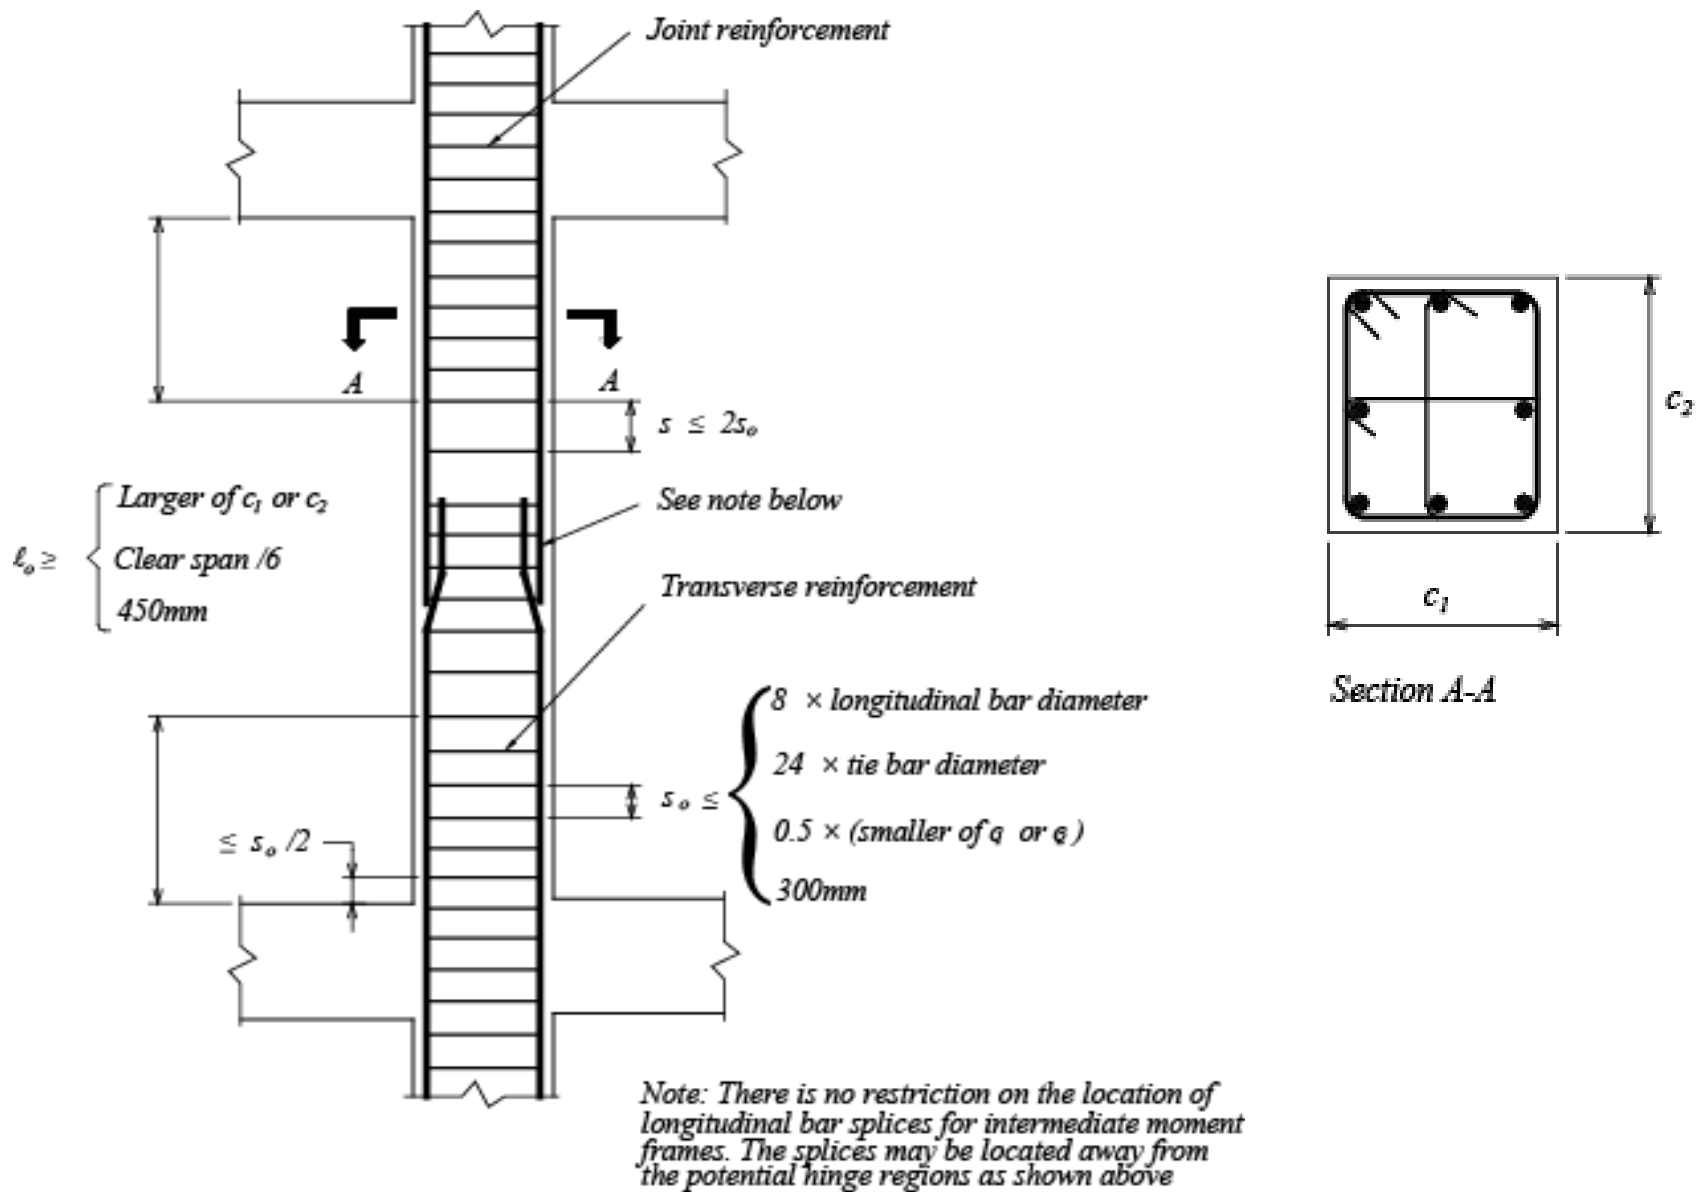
Transverse Reinforcement Requirements for Columns
